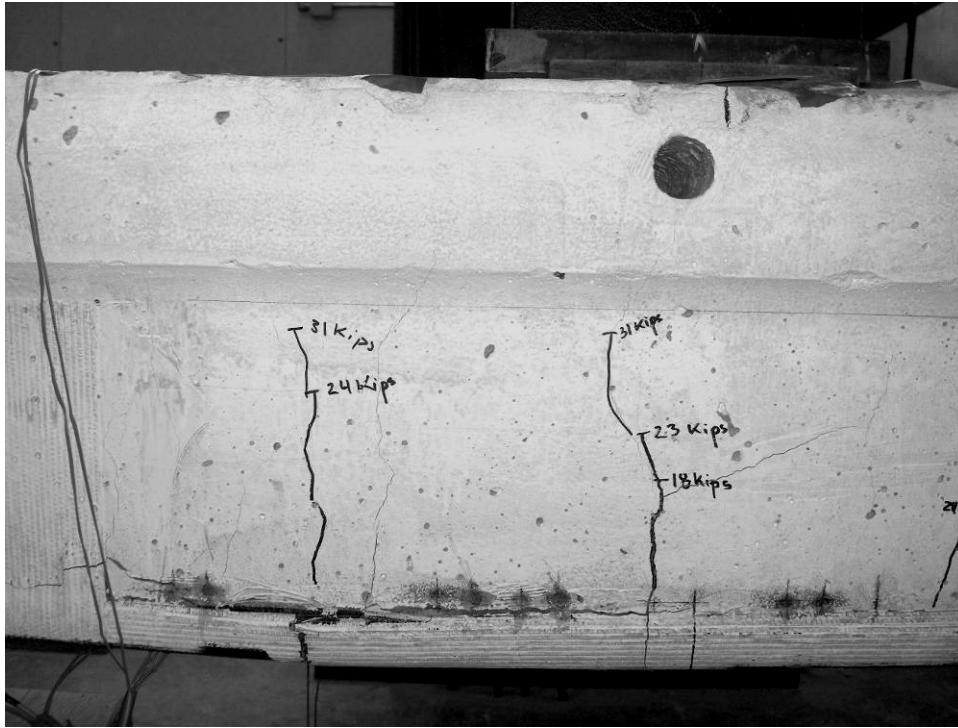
Rupture of high modulus CFRP sheets at midspan in girder EB6S
